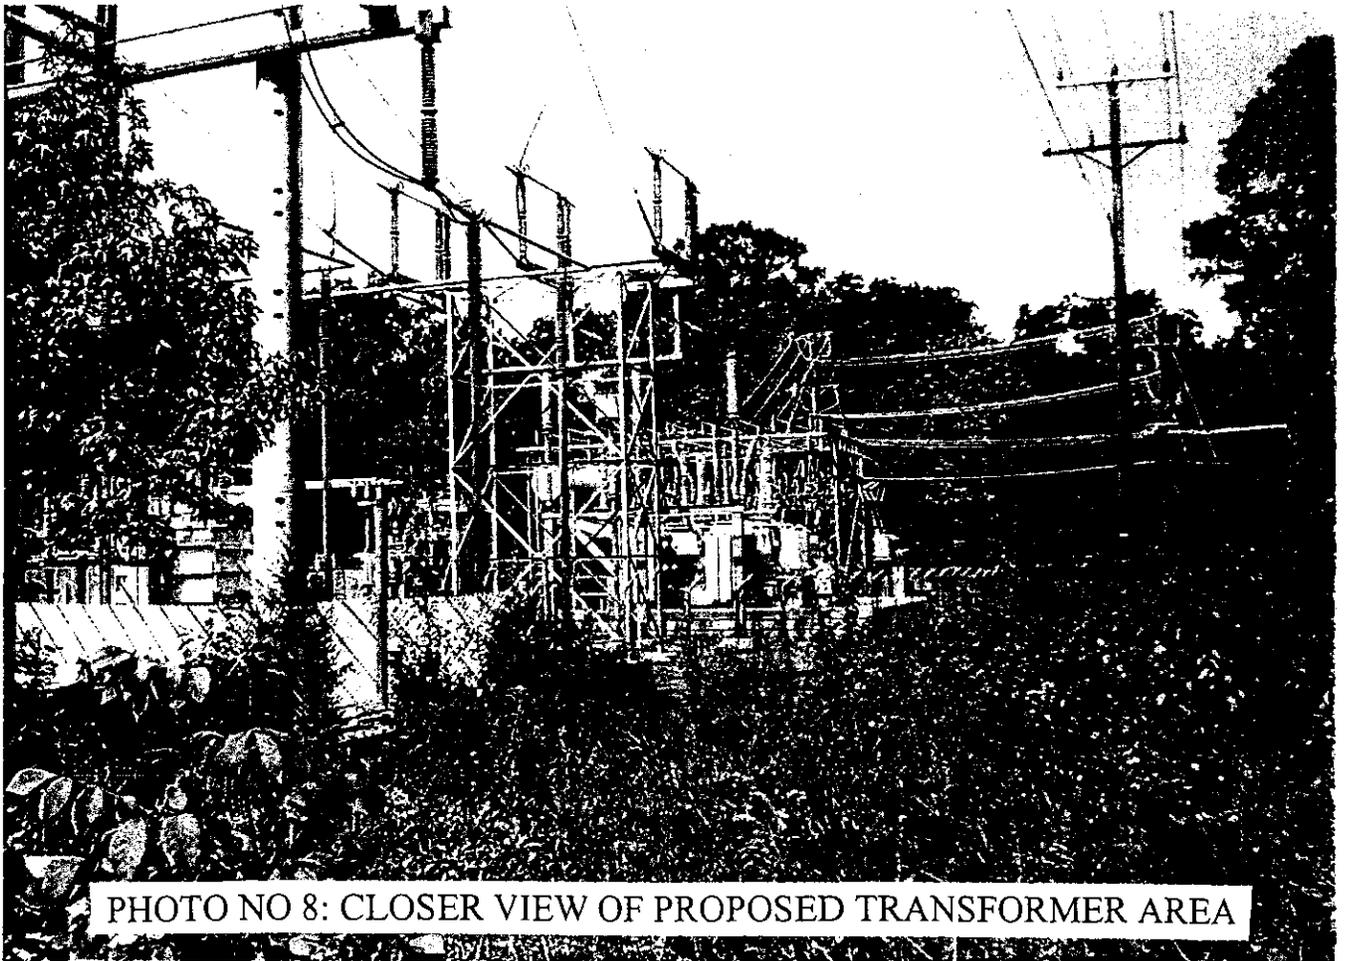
CLOSER VIEW OF PROPOSED TRANSFORMER AREA
